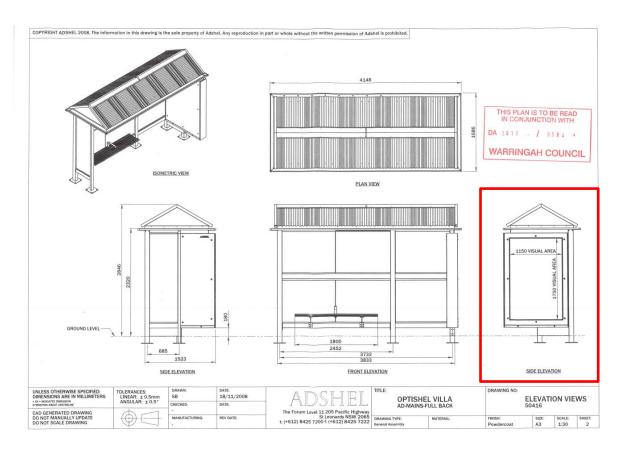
Shelter G1 DA2011/0384 Stamped Elevations
